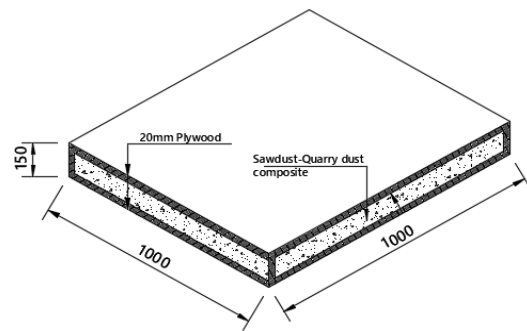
Typical example of Sawdust – Quarry dust – Plywood composite slab
